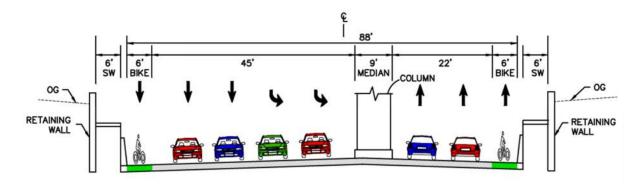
(cont'): Mary Avenue Underpass Tunnel with Jughandle Alternative (Cross-Sections)
